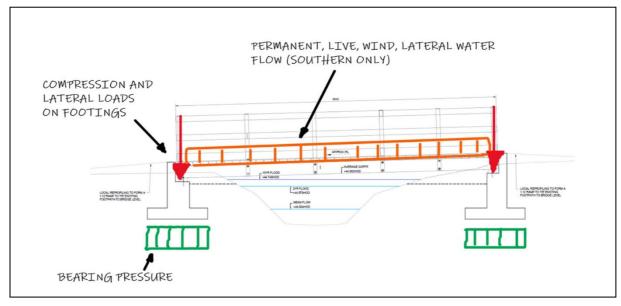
Idealised load diagram for bridge structure, flow control structure and foundation loading
